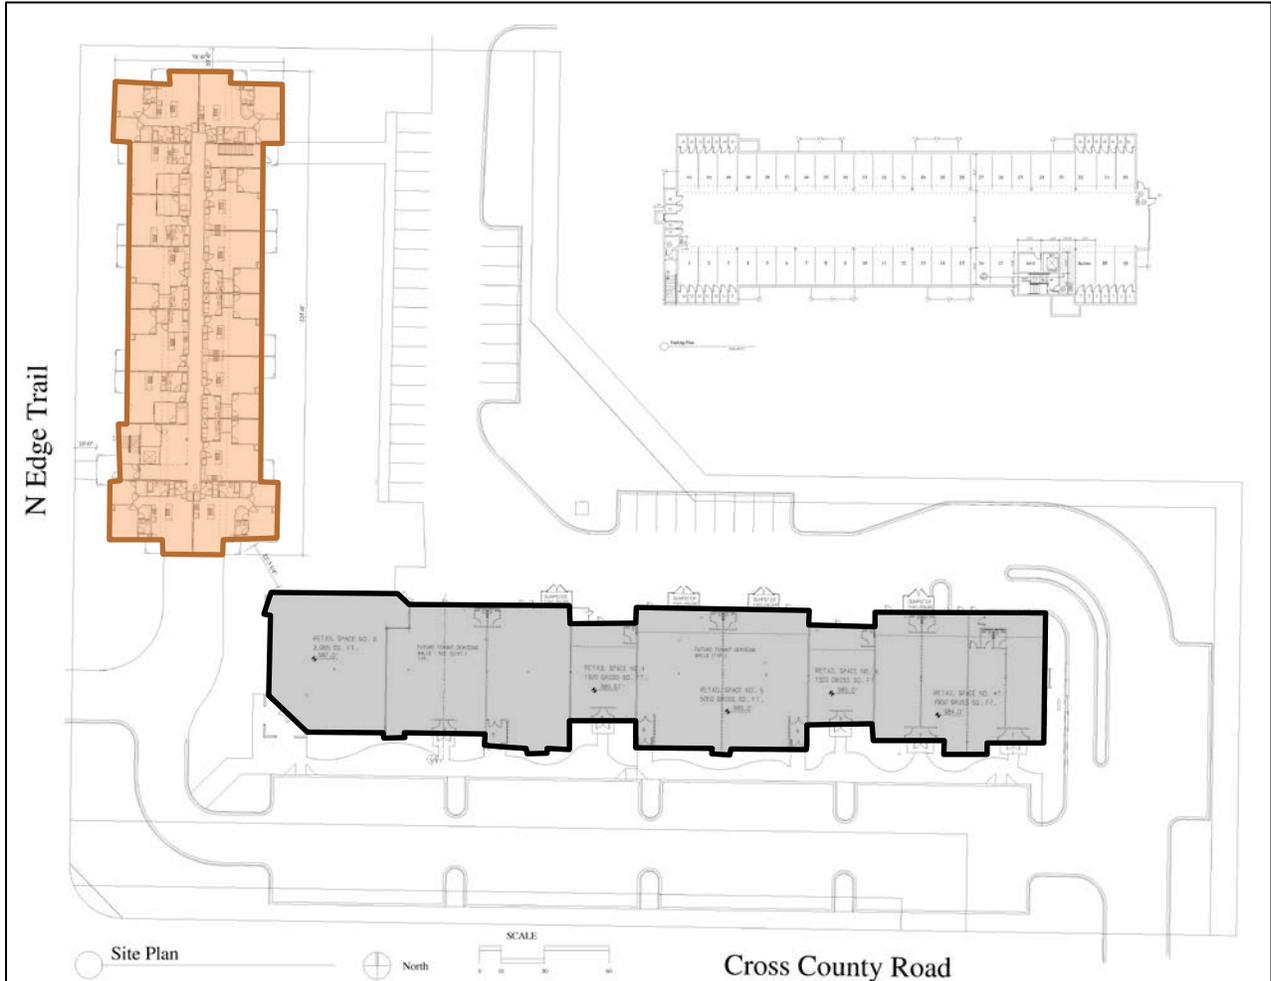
Concept Plan with existing building in gray and proposed building in orange.
